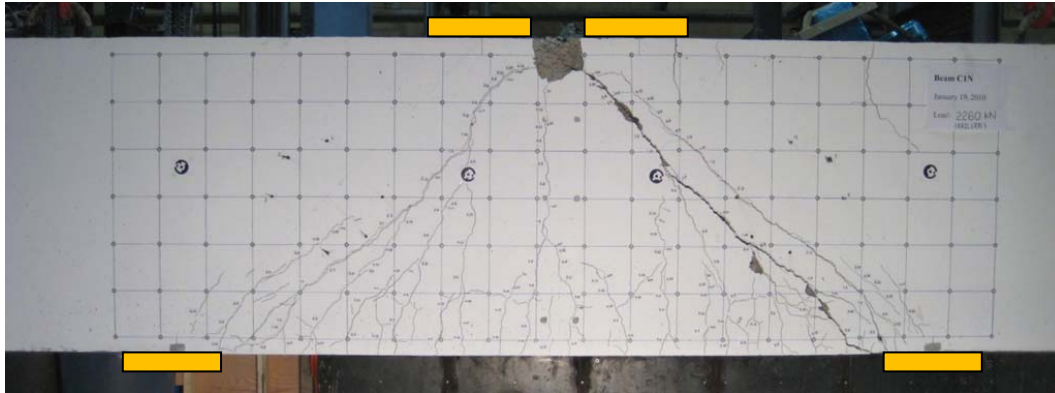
Front side of specimen C1N after testing with the failure crack visible in shear span B (right).
